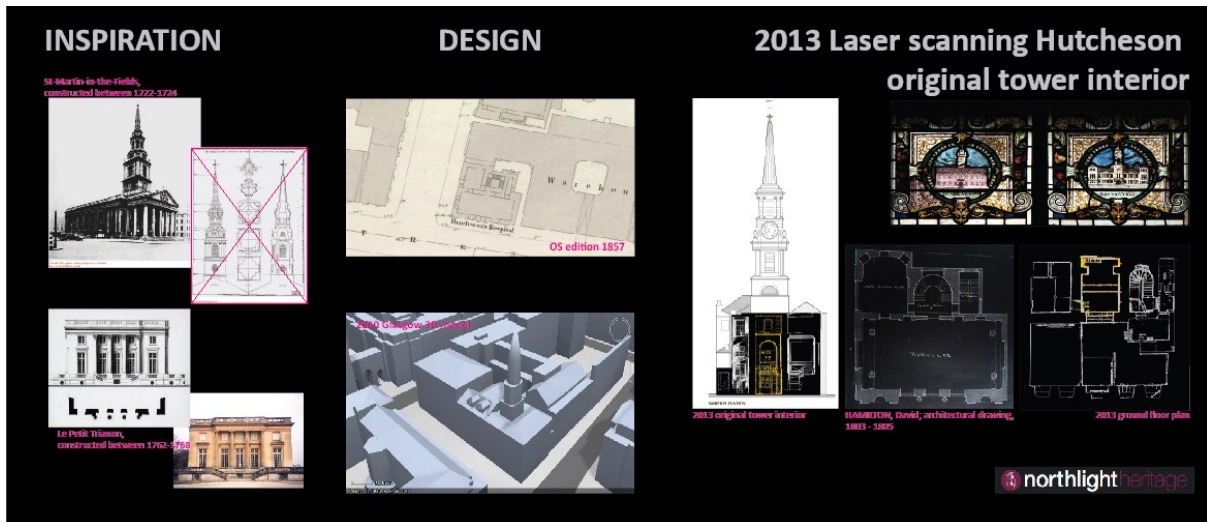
Northlight Heritage at Hutcheson's hall, Glasgow – elevations generated from laser scanning
